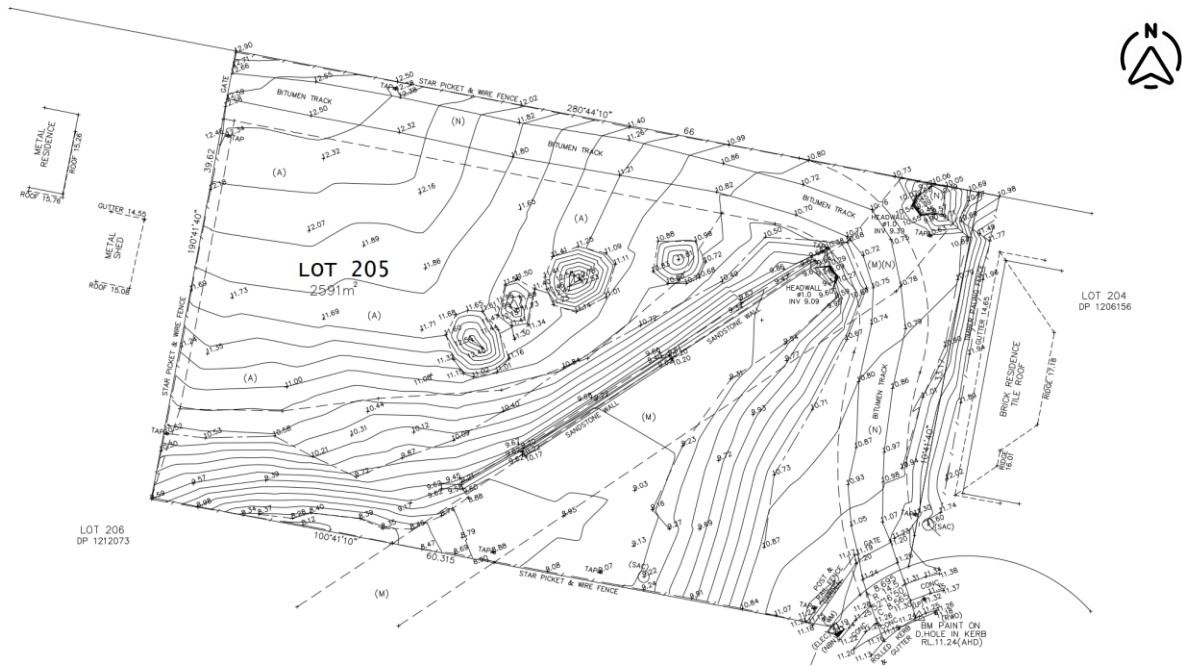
Child Care Centre Plans (ArtMade Architects)
